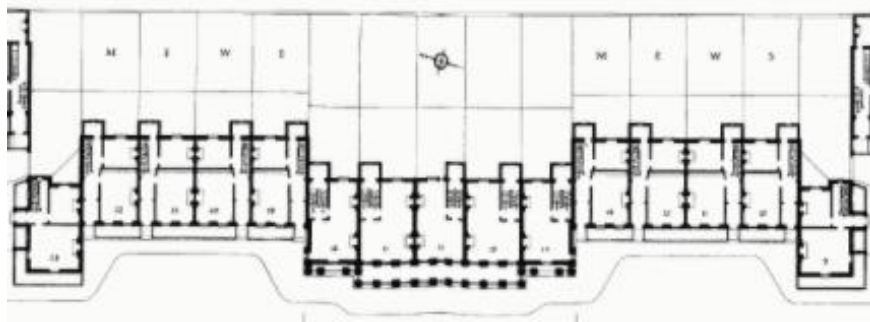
Ground Plan (first floor of the centre five houses) of Cumberland Terrace (1938), *Survey of London*.
